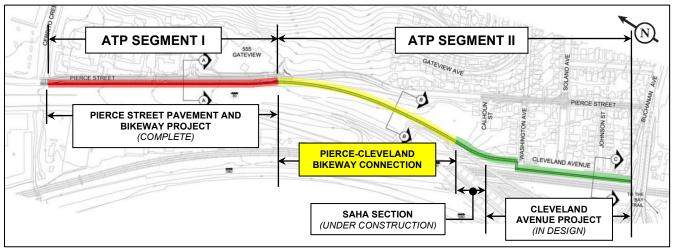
Potential Pierce Street Path Alignment, Kimley-Horn & Associates (2009), amended to including ATP Project Segments and Project Names
